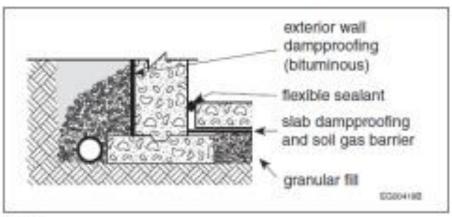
and 9.25.3.6.-A Dampproofing and soil gas control at foundation wal/floor junctions with solid walls Floor Wall Joint - If accessible, the joint between the foundation wall and basement floor can be sealed. This joint can be a major contributor to the radon levels in a home.
